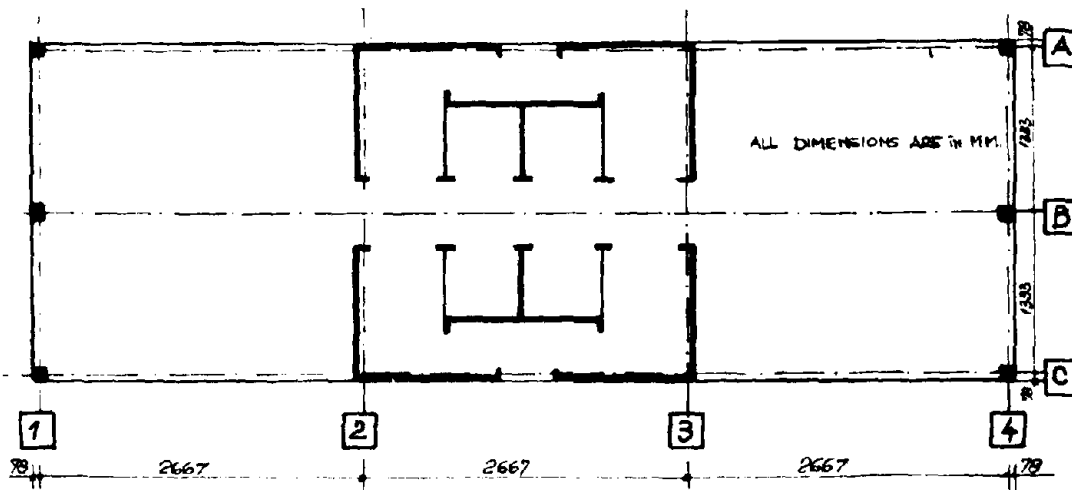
MODEL OF A CENTRAL CORE STRUCTURE - PLAN SECTION
